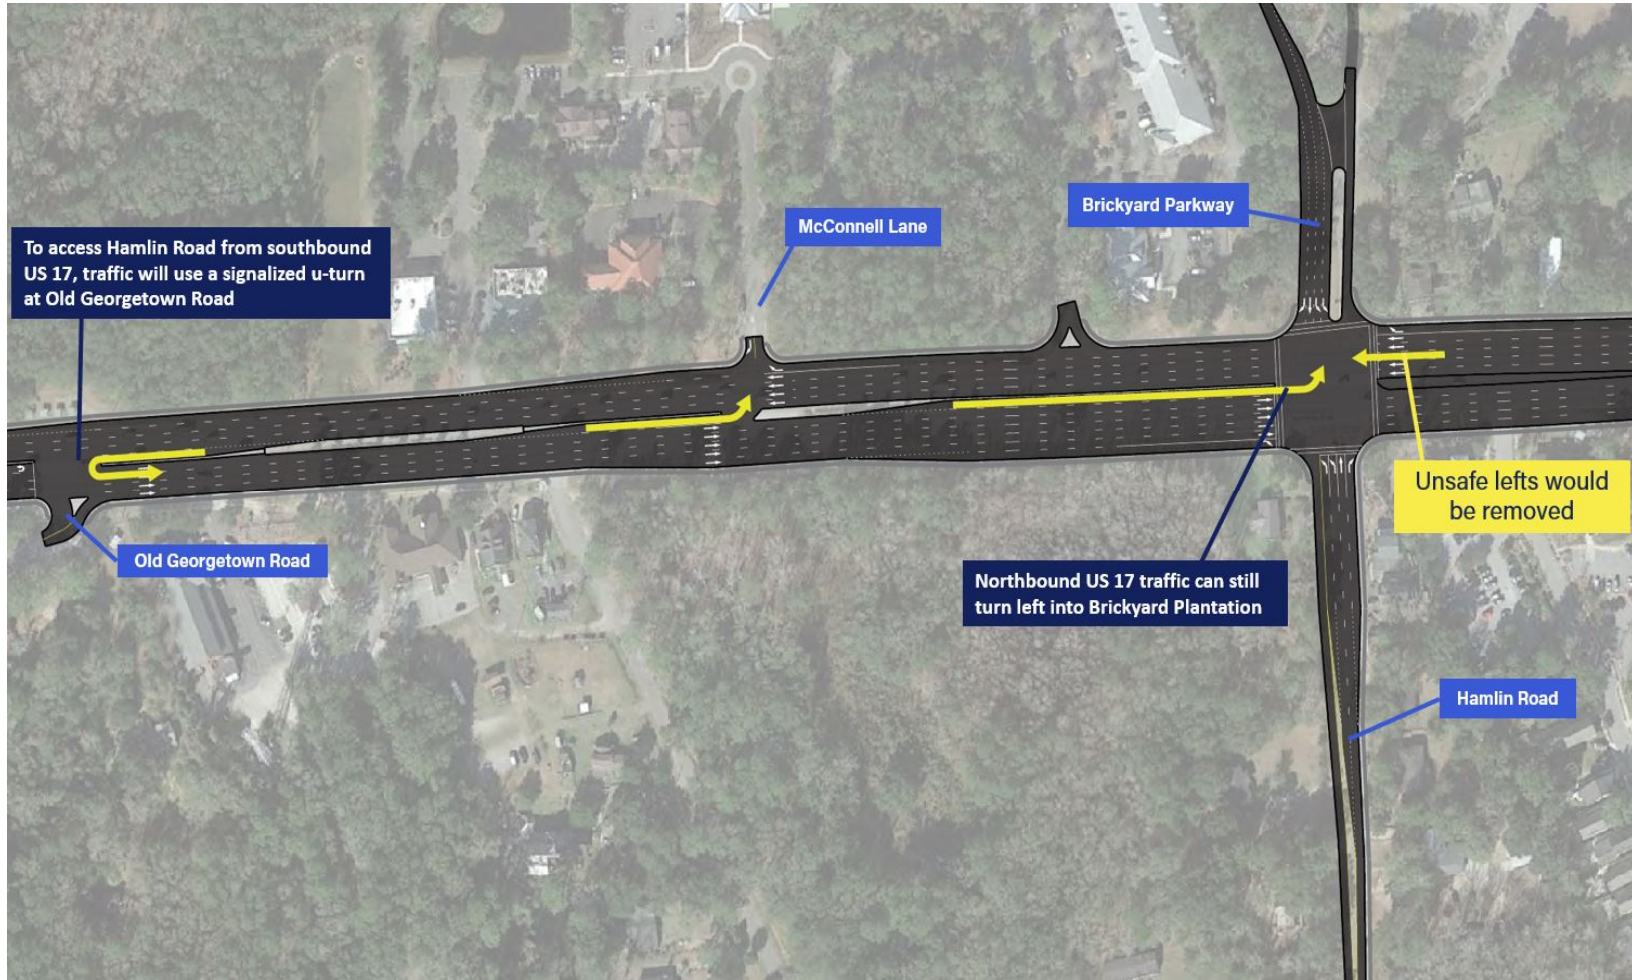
Updated Design Concept – Brickyard Parkway/Hamlin Road and US 17 Intersection
